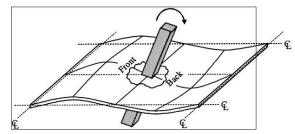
Behavior of Slab-Column Connection in Flat Slab Structure
